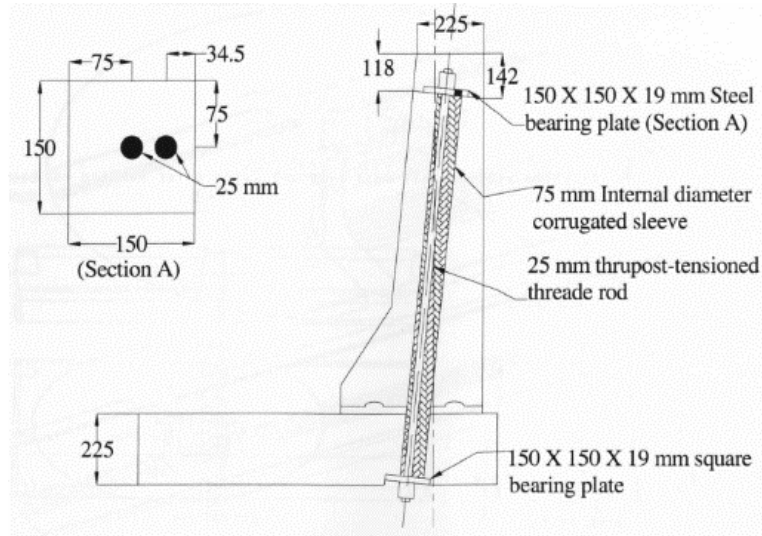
Through-deck bolting detail developed by Florida DOT
